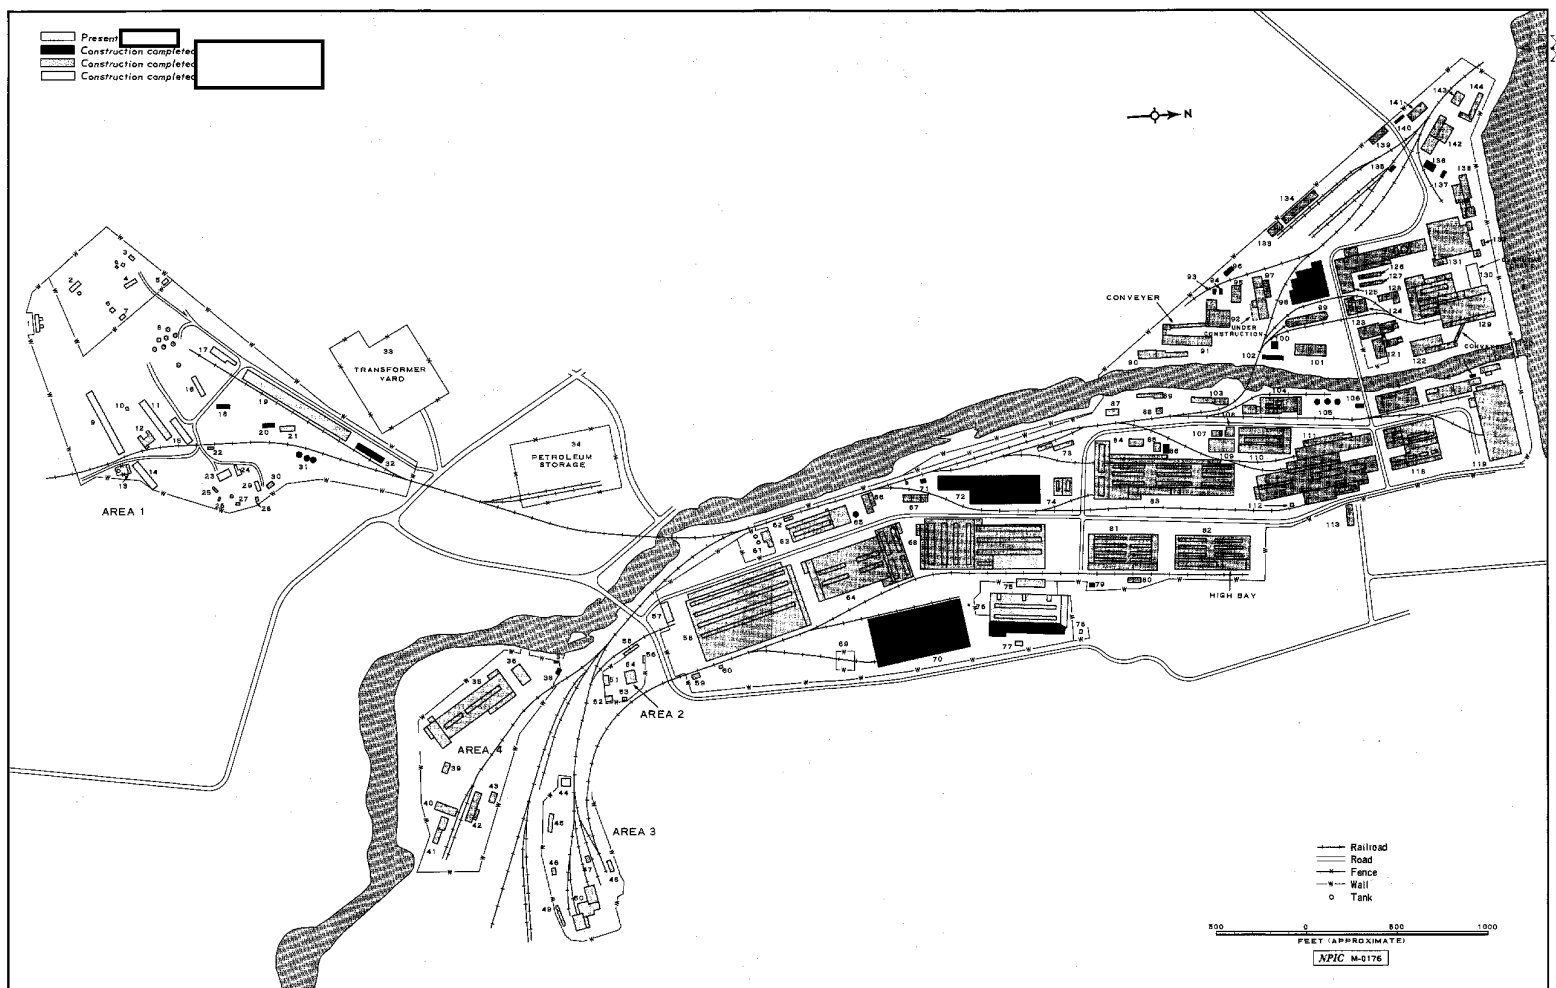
LAYOUT OF ARMS MACHINE AND STEEL PLANT 235, VOTKINSK, USSR.
